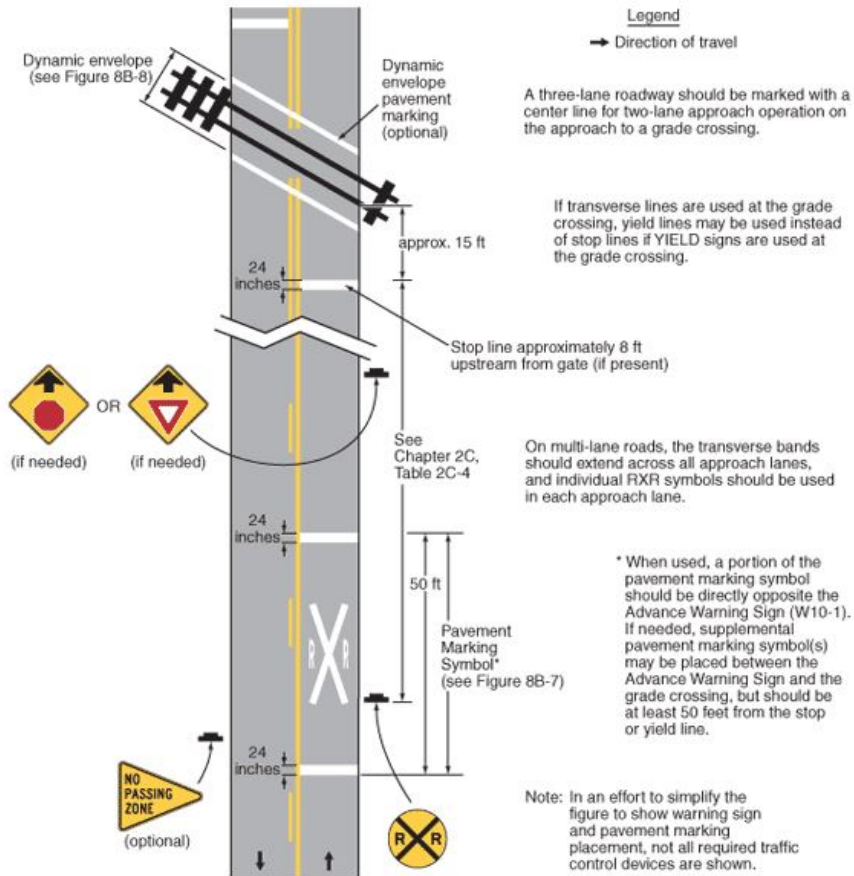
B-6. Example of Placement of Warning Signs and Pavement Markings at Grade Crossings
